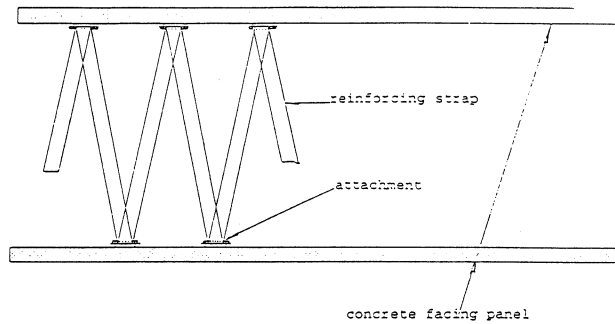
Reinforcement Layout of TBB Freyssisol Wall
